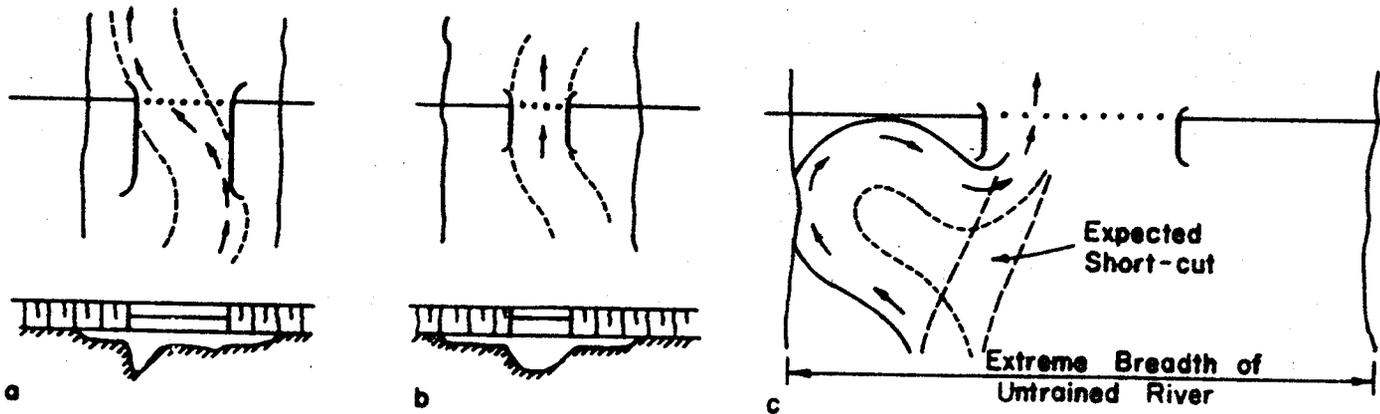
Guide bank plan (from Ref. 29).
